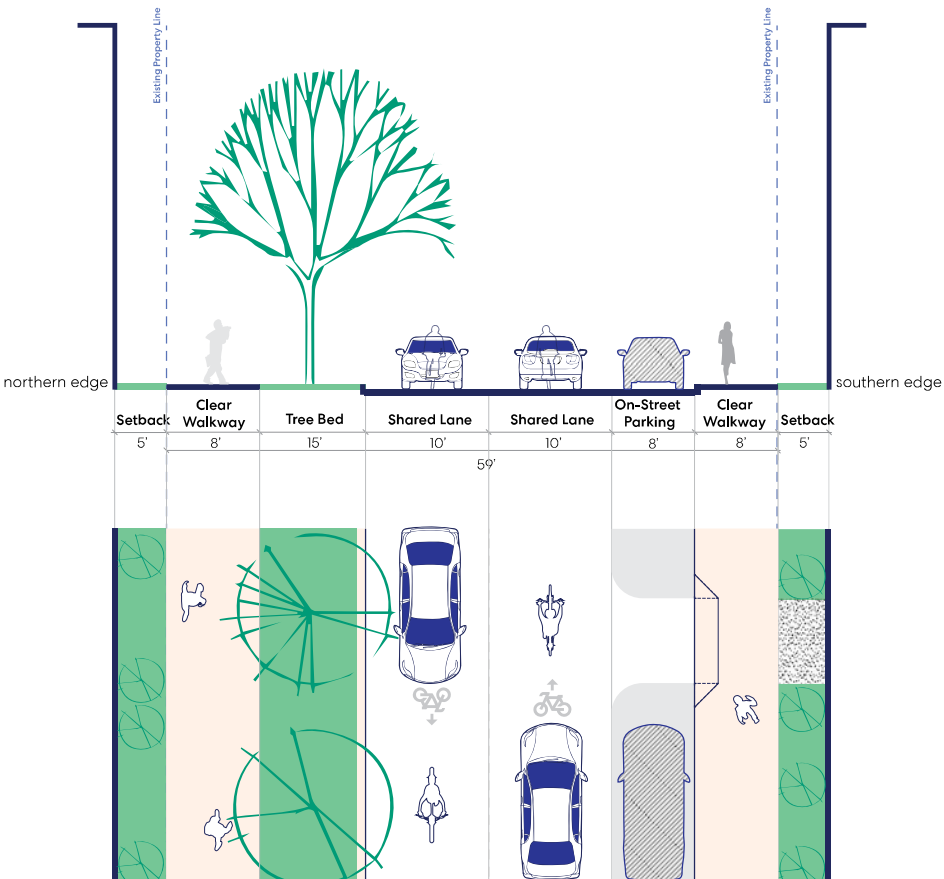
Typical Portage Avenue section between Ash Street and El Camino Real
